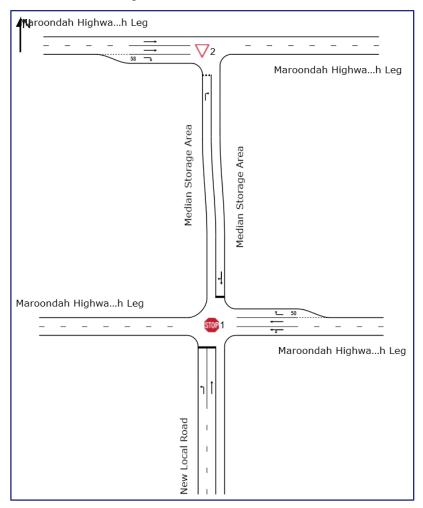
Adopted SIDRA Intersection Layout - Staged Right Turns
